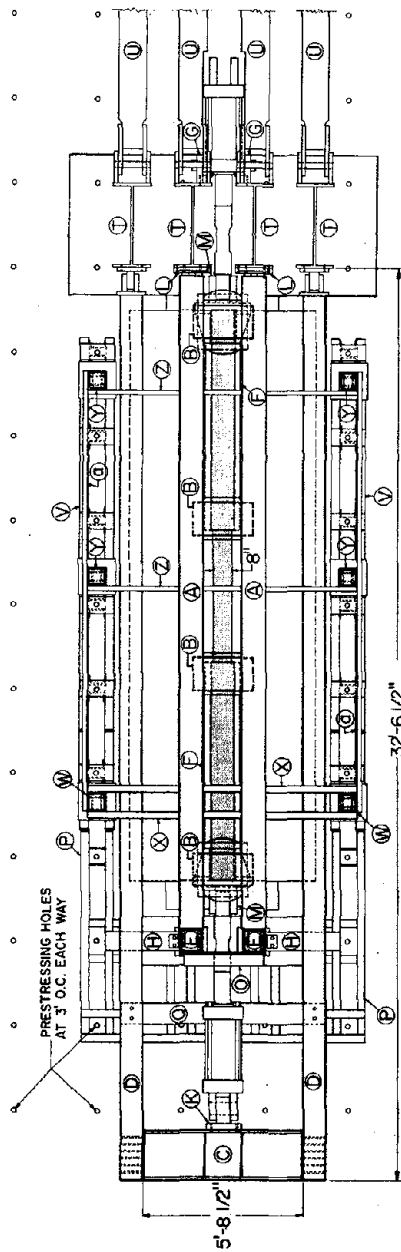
TOP VIEW OF THE SPECIMEN AND THE TEST FRAME
